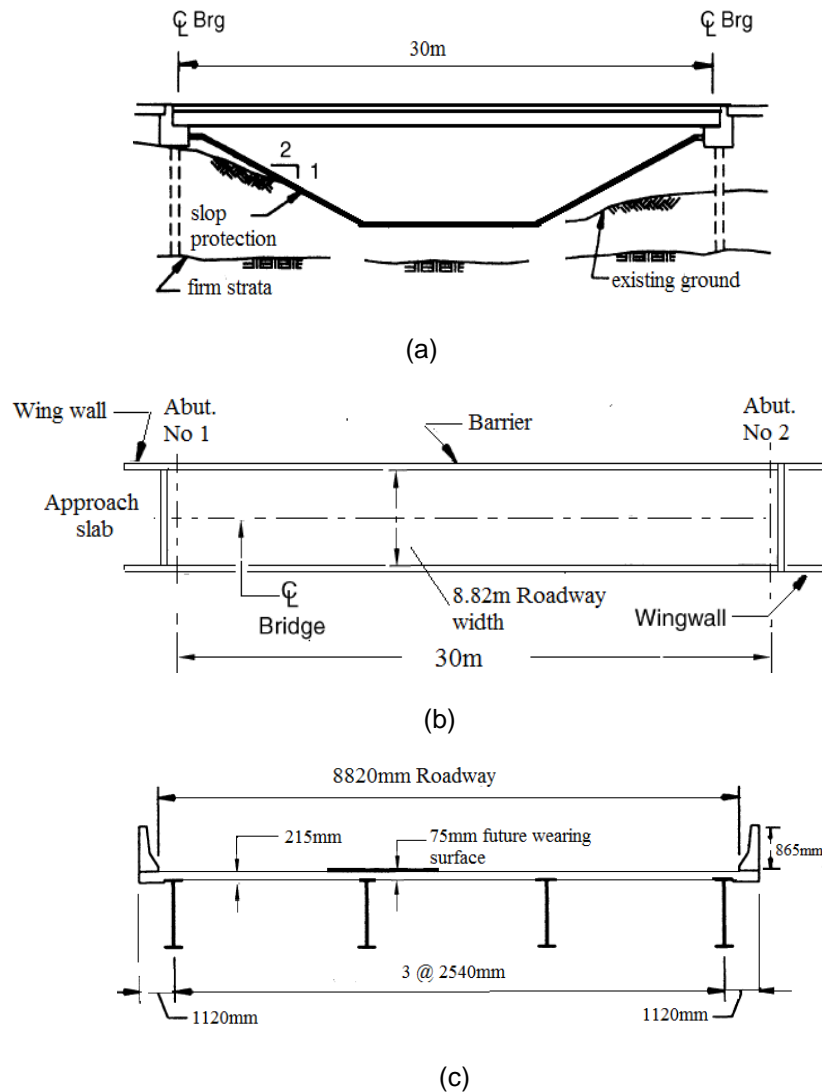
Steel plate girder bridge design example: (a) General elevation, (b) plan view, and (c) cross-section
